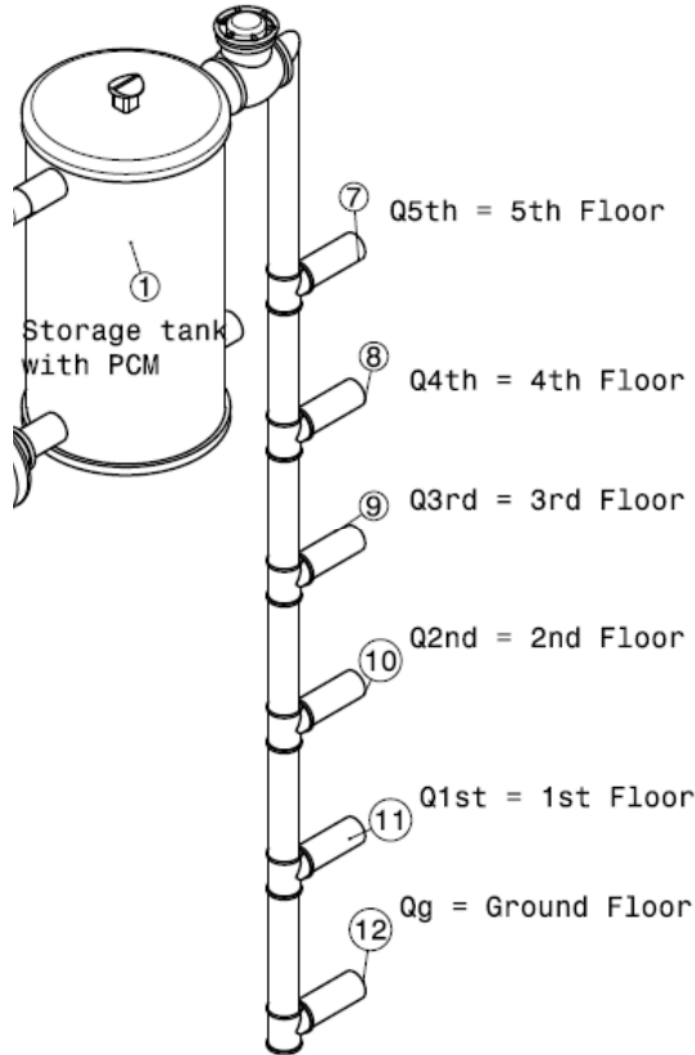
Layout of hot water discharging from storage tank to all floor building
